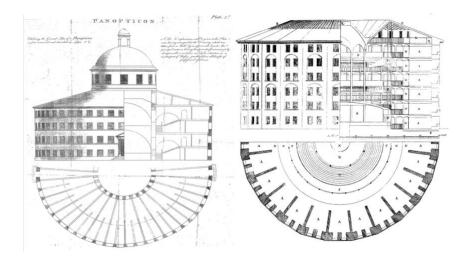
Architectural drawings of the panopticon prison by Willey Reveley from the 1791 plans
